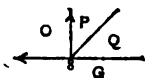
Unsymmetrical Truss. Forces at Joint 8
